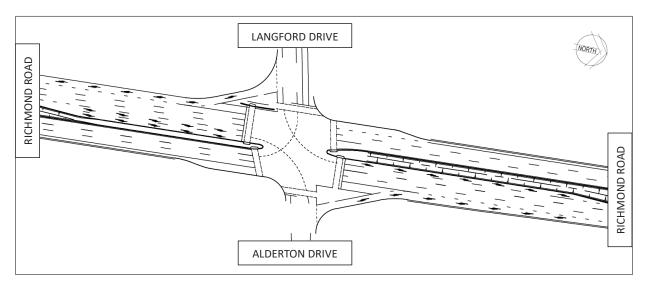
Plan view of the proposed Richmond Road / Langford Drive / Alderton Drive intersection
